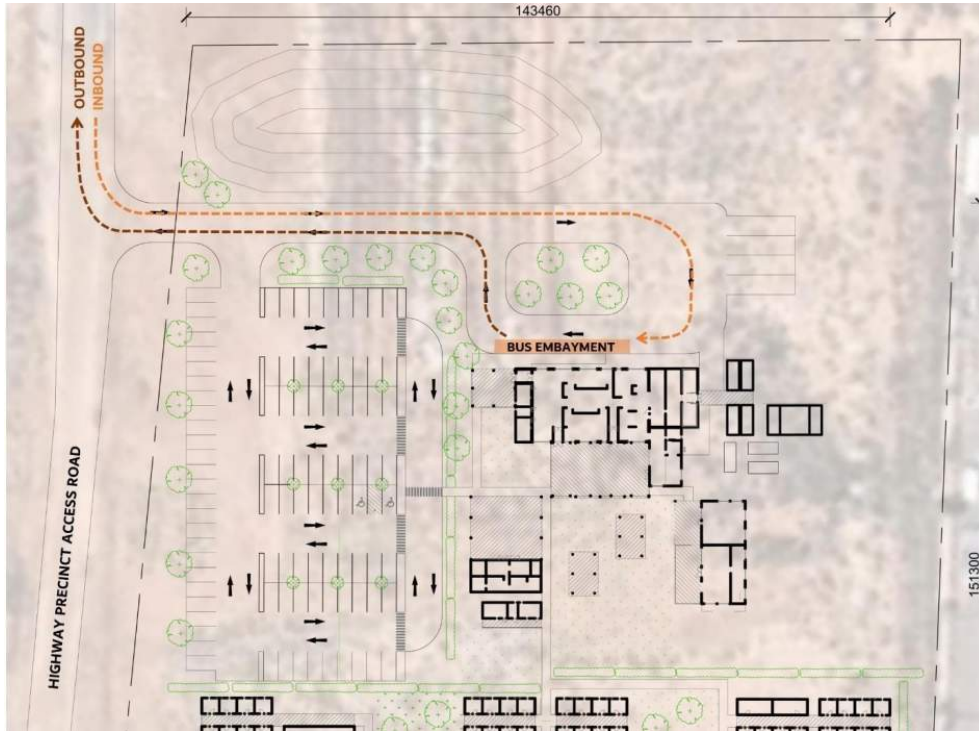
Proposed bus pick-up / drop-off movements into and out from the site (base plan source: Grounded, 2022)
